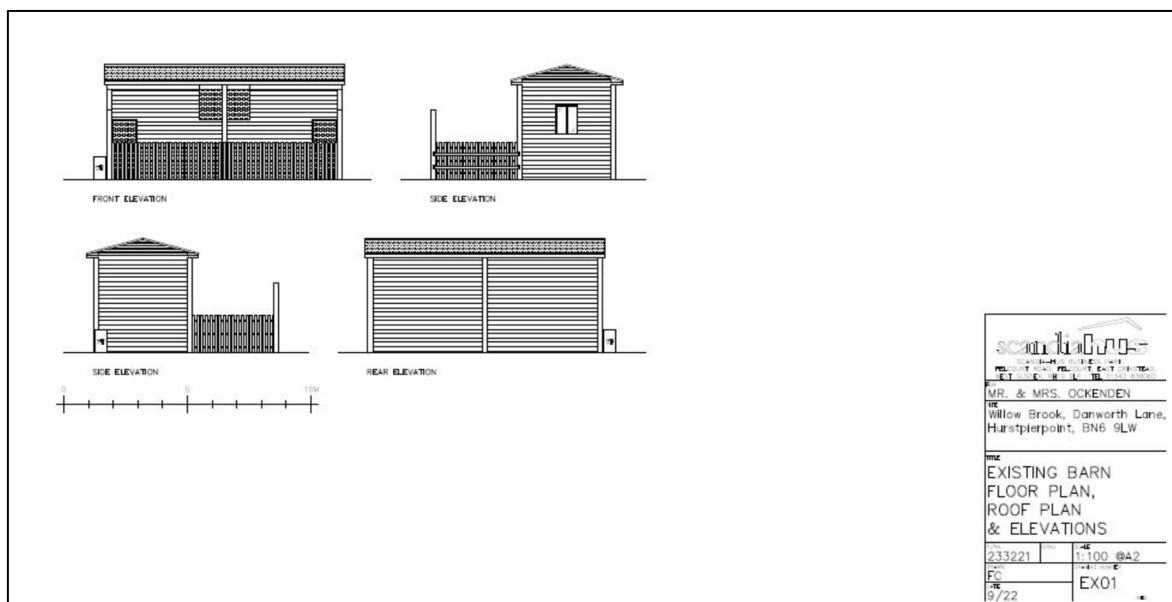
The existing plan of Willowbrook, Danworth Lane, Hurstpierpoint, Hassocks.
